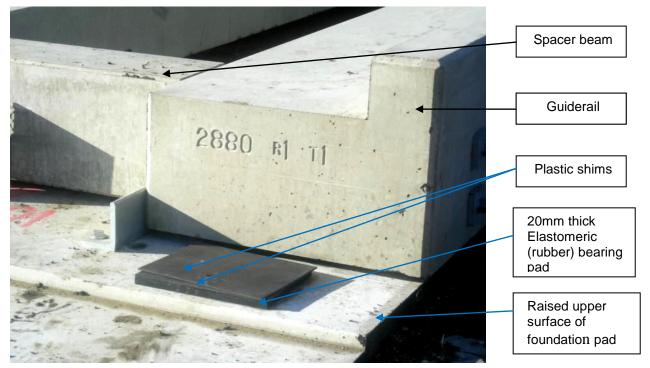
Photograph of a part of the guideway during construction, showing a spacer beam, guiderail, shims, bearing pad, and foundation pad.
